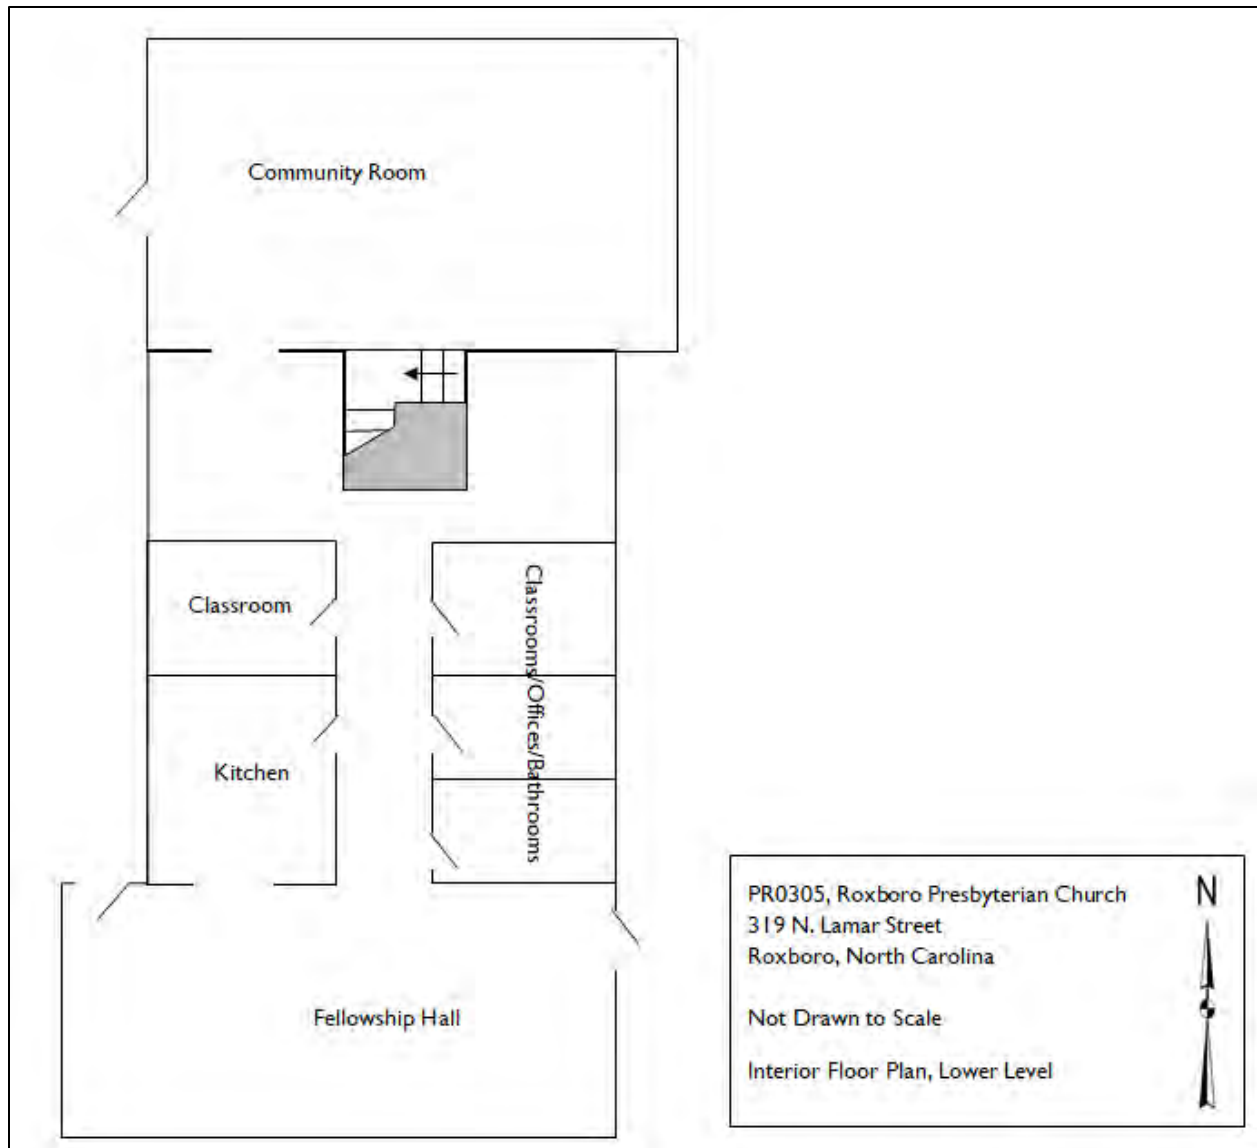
Roxboro Presbyterian Church (PR0305) Interior Floor Plan, Lower Level.
